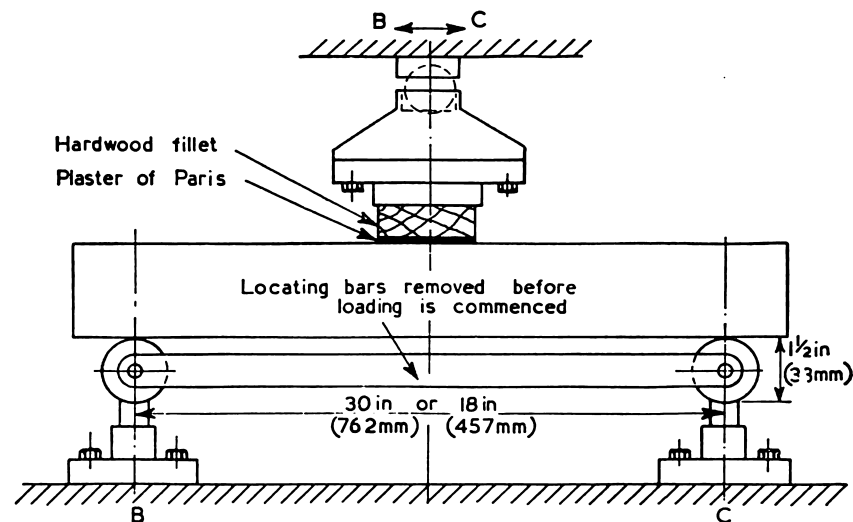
Arrangement of loading for transverse strength test: side elevation
